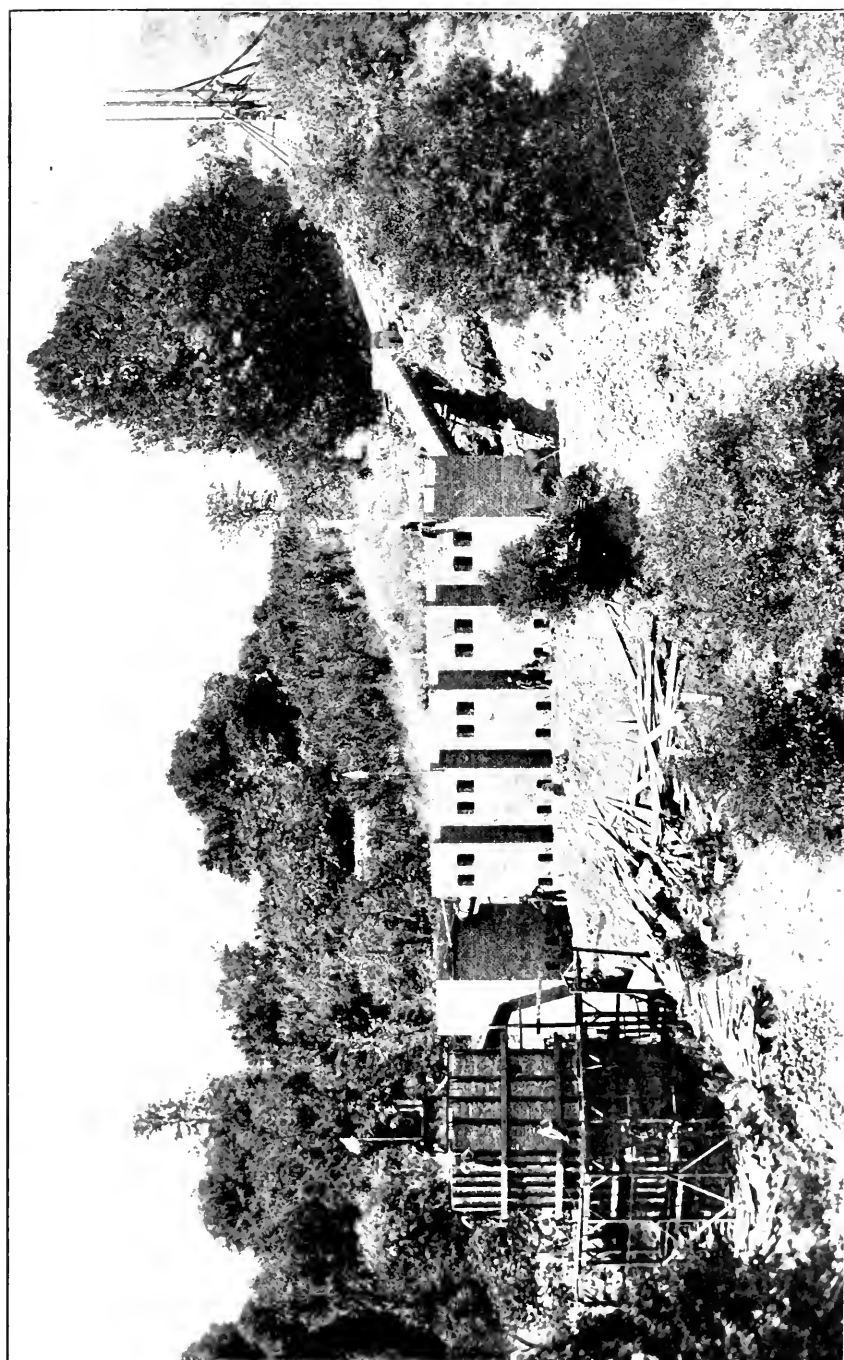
REDUCTION PLANT IN COURSE OF CONSTRUCTION. SILVER CREEK QUICKSILVER MINING CO., SANTA CLARA COUNTY.
